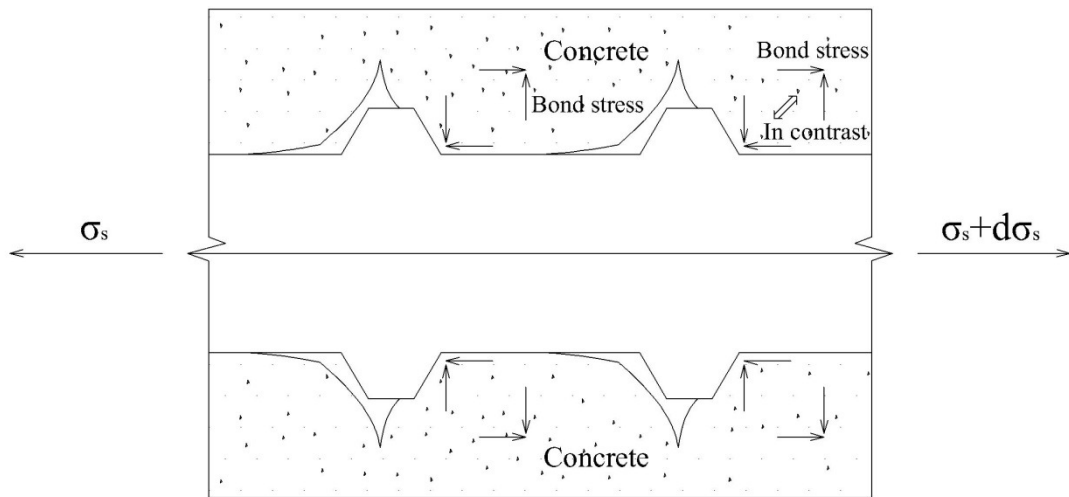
Splitting of concrete surrounding deformed steel bar
